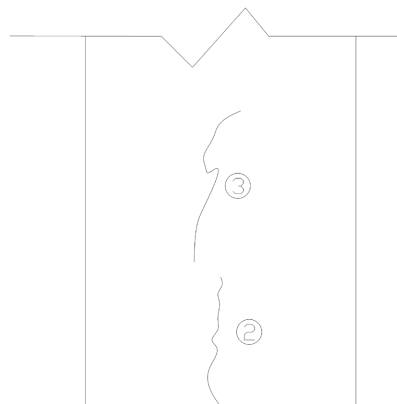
Diagram of bottom crack at the end of the top slab of left box girder DY42-DY43.
